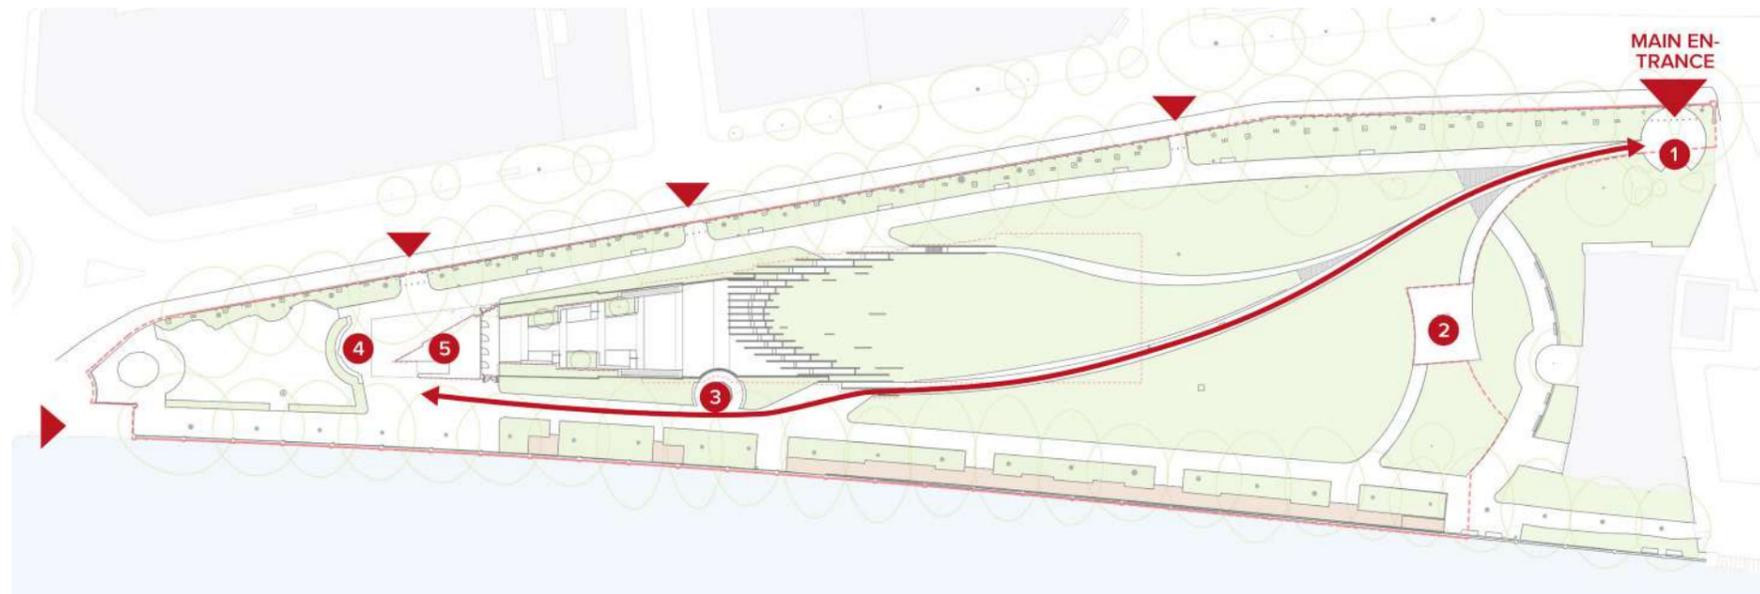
PROPOSED SITE PLAN WITH EXISTING MONUMENTS
